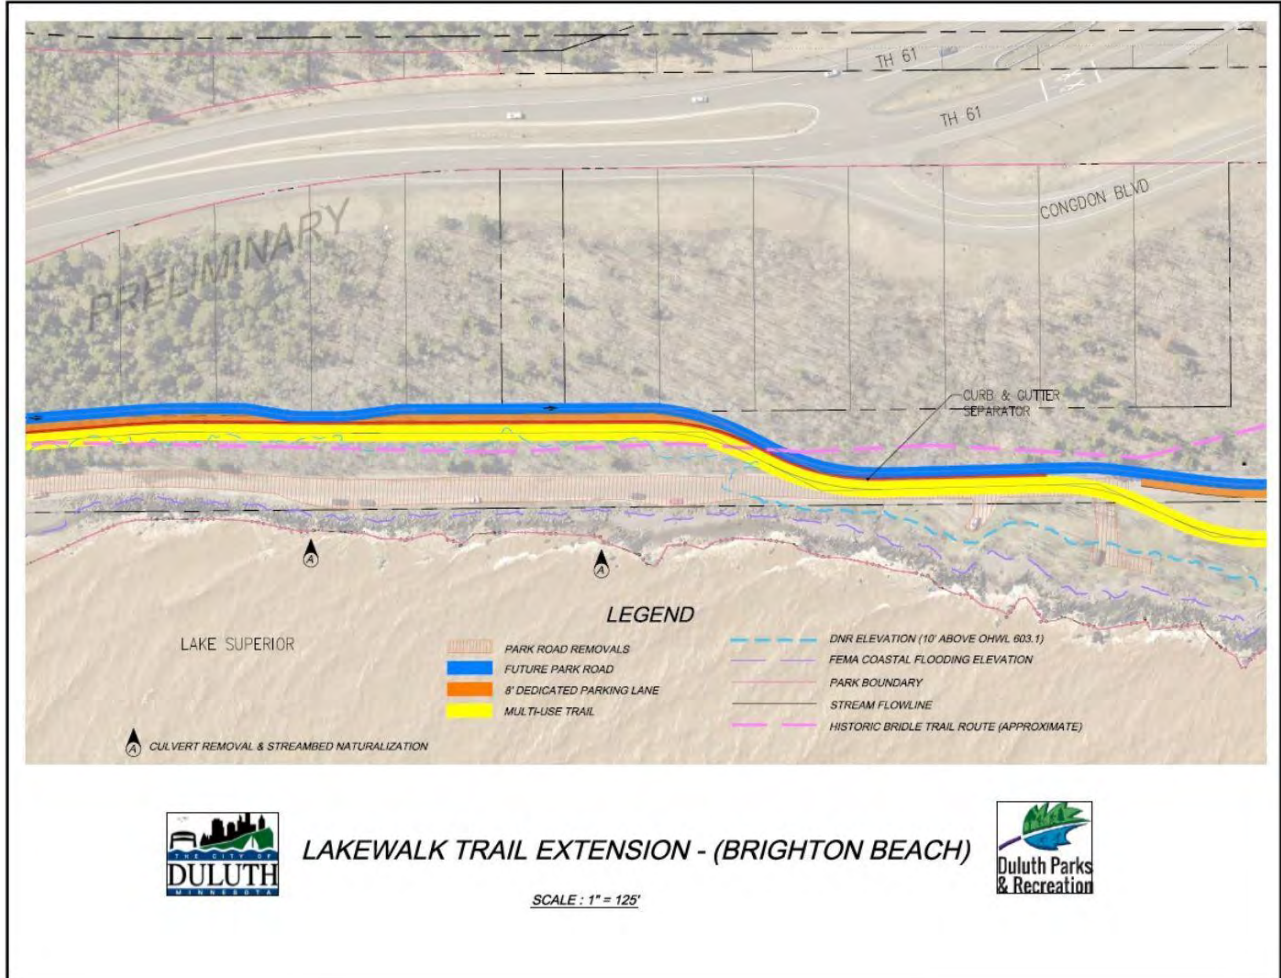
Preliminary proposed roadway realignment, view of Kitchi Gammi Park and Brighton Beach Road, showing new roadway connection to Congdon Boulevard. New roadway indicated in blue. Trail extension indicated in yellow. Parking areas indicated in orange. Applicant plan.
